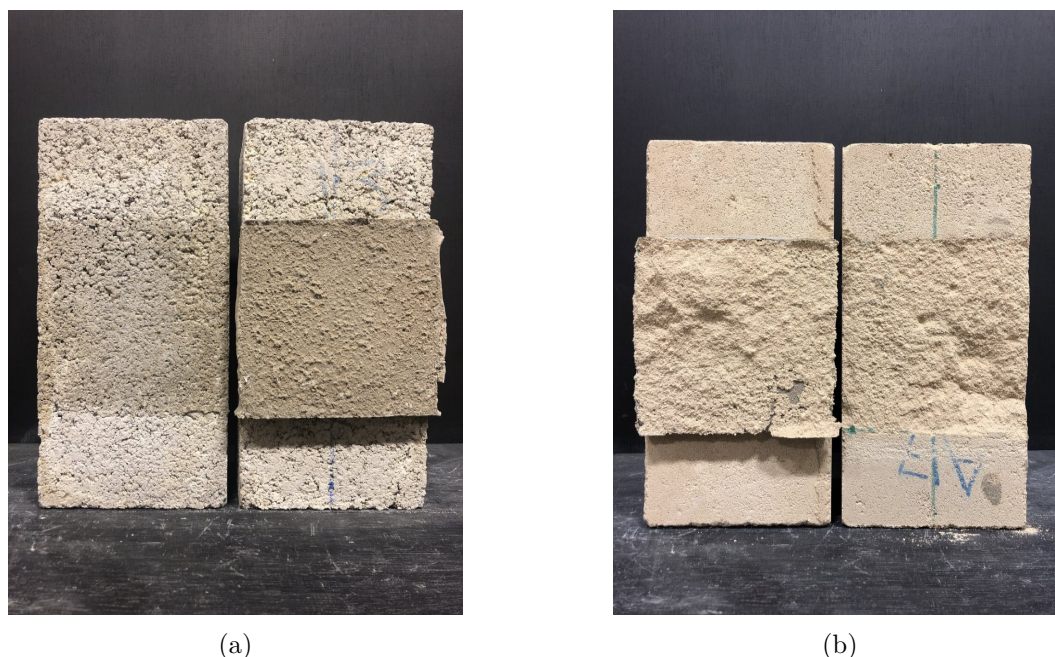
Crossed brick couplet test failure types (a) B1 and (b) B5
